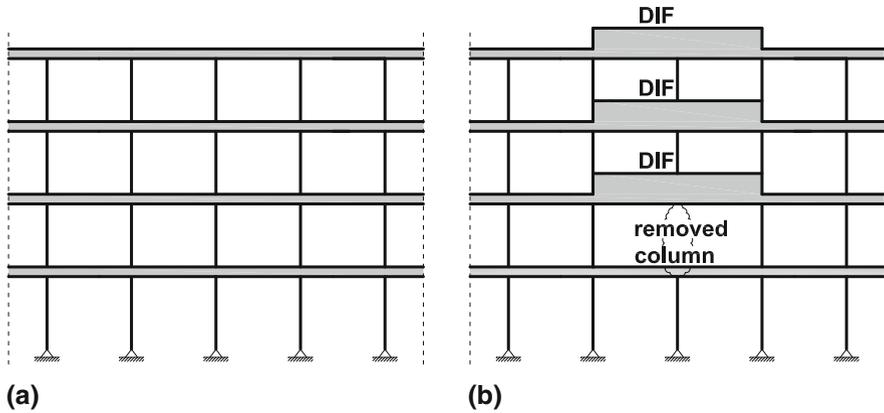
Frame loading scheme: a intact frame, b column loss at second floor
